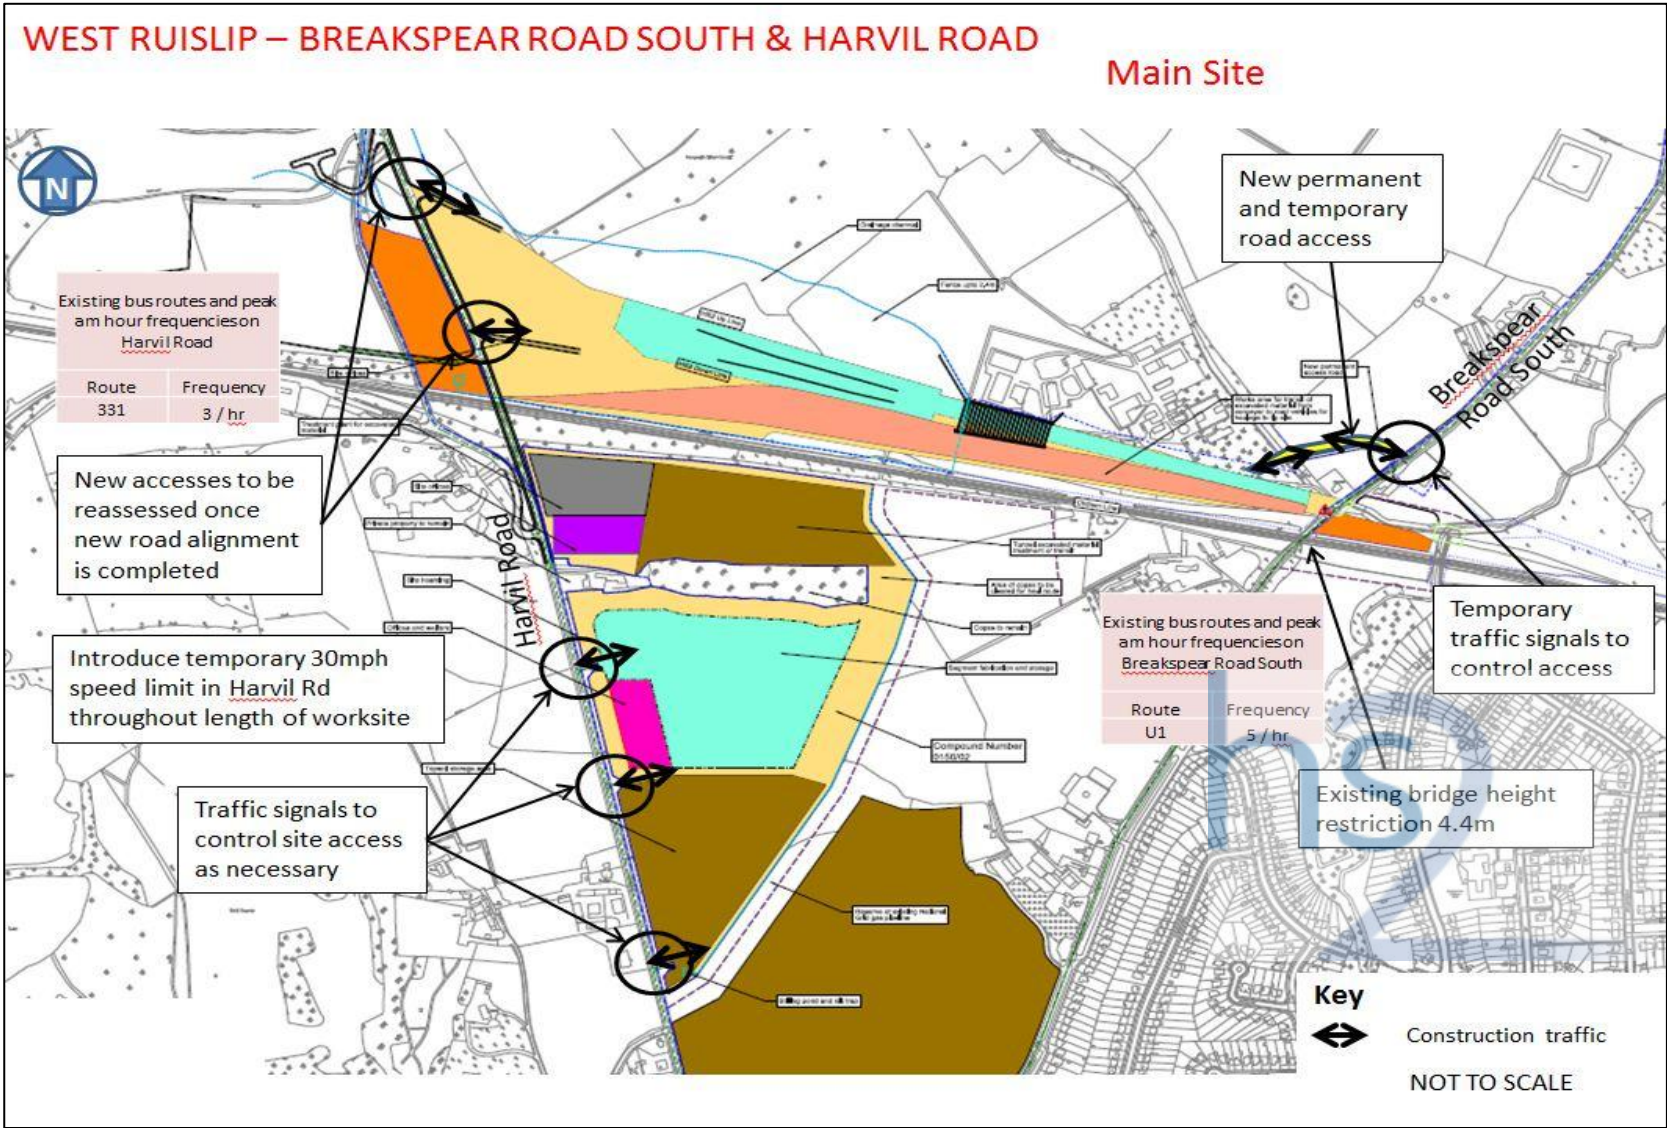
West Ruislip Tunnel Portal site and local access and egress
